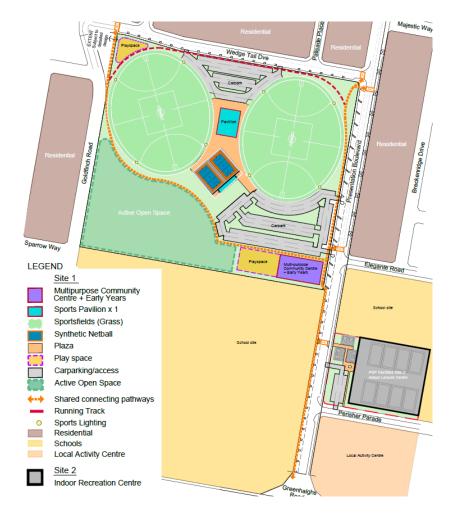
Greenhalghs Road LAC Community Facilities Concept Plan
